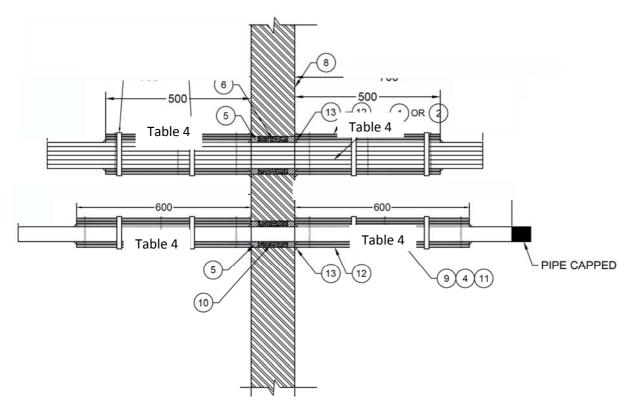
Typical details for wrapped cables and metal pipes for masonry walls 150mm thick
